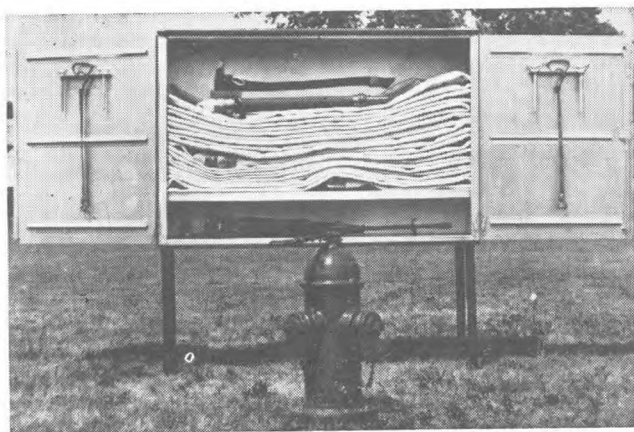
Hose house of steel or aluminum construction. This type can be installed on legs as illustrated or installed on a wall near, but not directly over, a yard hydrant.
